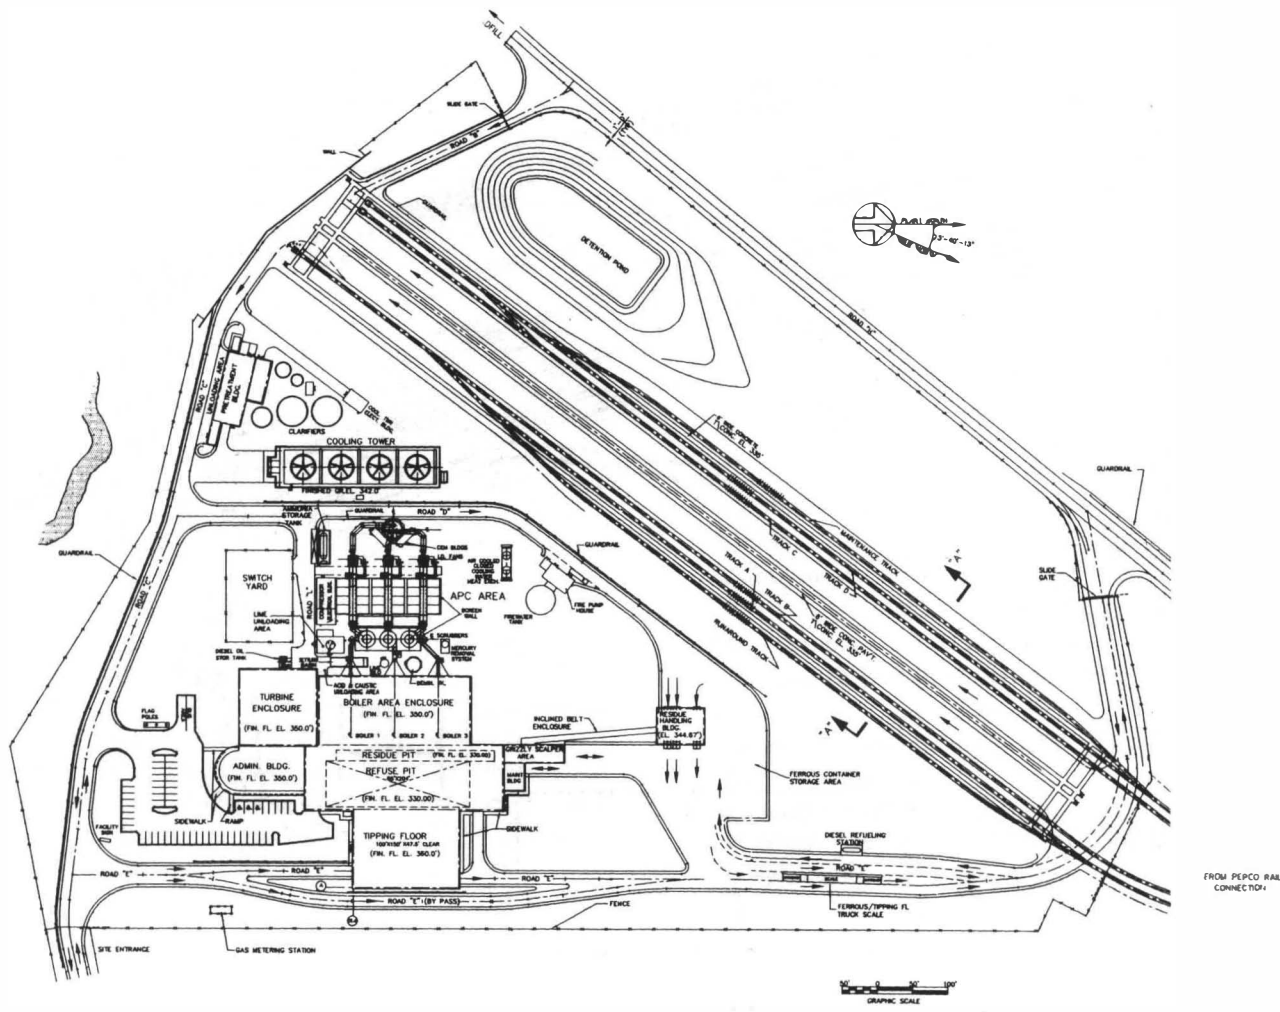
FACILITY TRACK LAYOUT AND SITE PLAN
